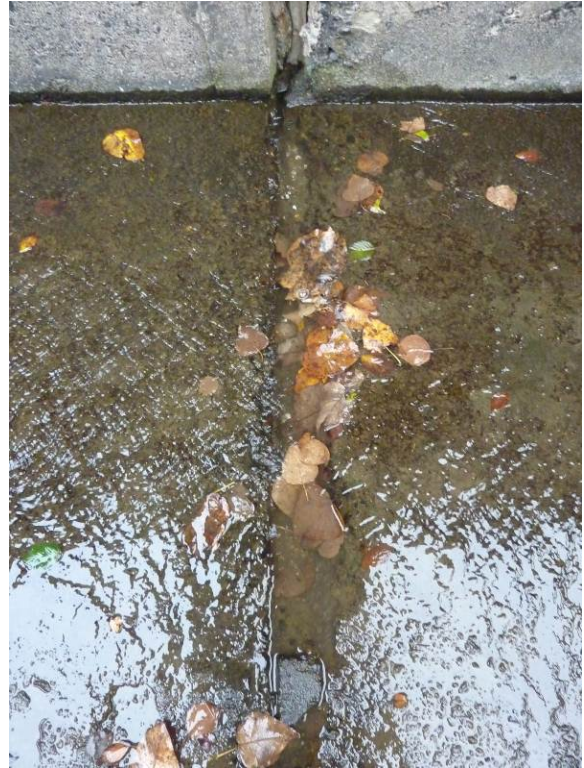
Floor Joint between Weirs 37 and 36
